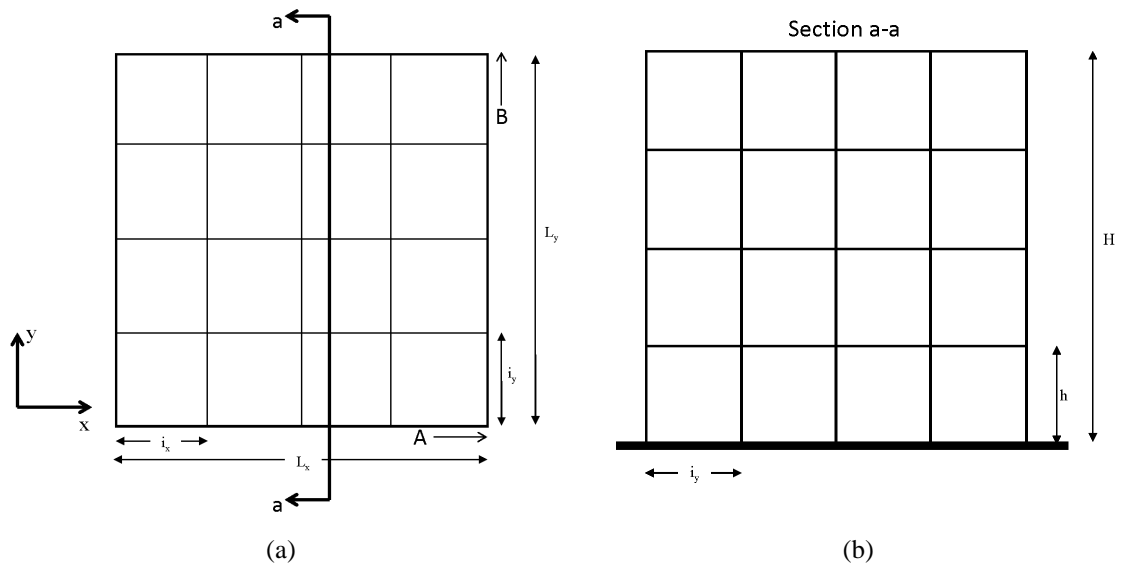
plan view (a) and elevation (b) of atypical regular RC frame building.
